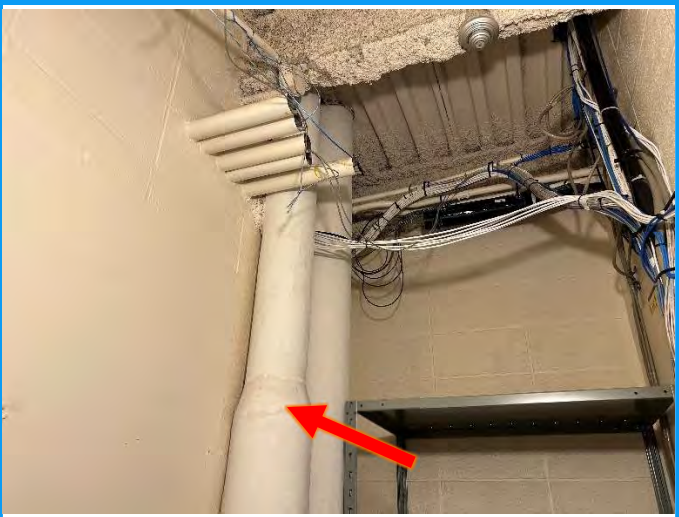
Typical view of the newly observed parging cement insulated pipe fittings (see arrow) observed in the electrical equipment rooms in the subject building.
